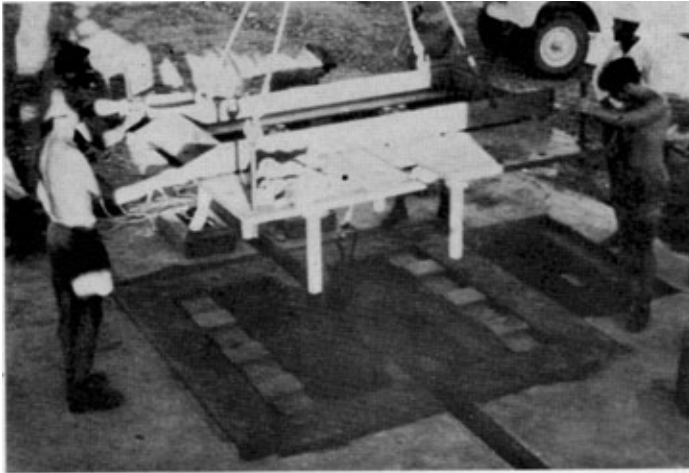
Installing a retractable runway edge sheave at RAF MASIRAH.
